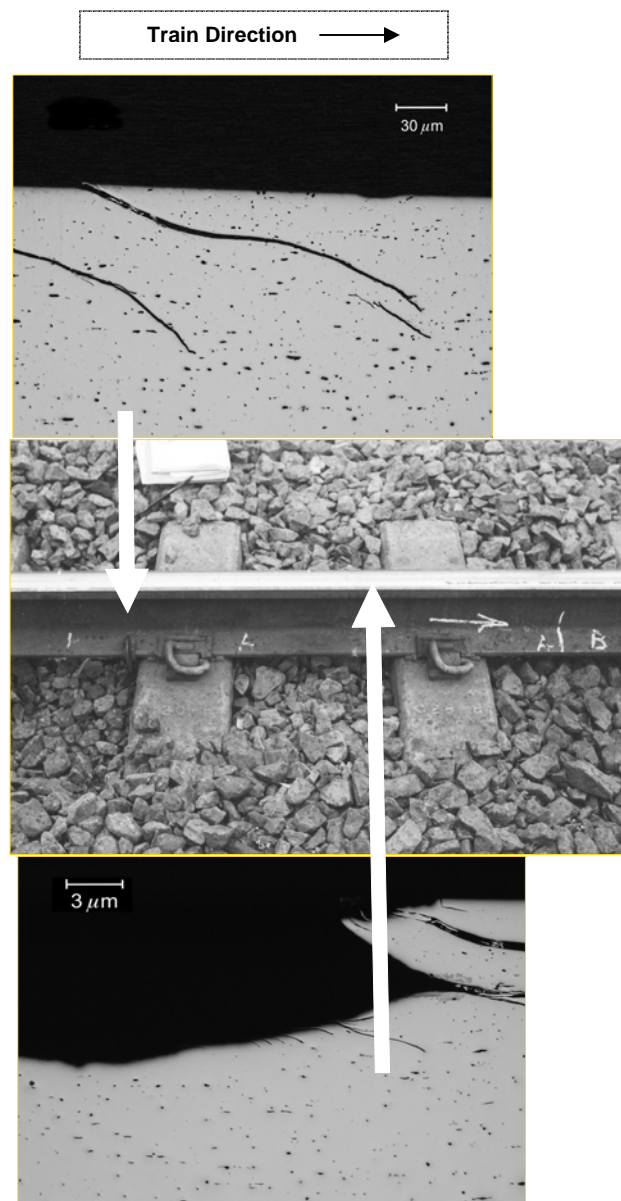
TOR Running Surface Showing Spalling Starting at Center (middle photo). Cross-Section of Rail before Spalled Site (top detail), in the Spalled Area (bottom detail)
